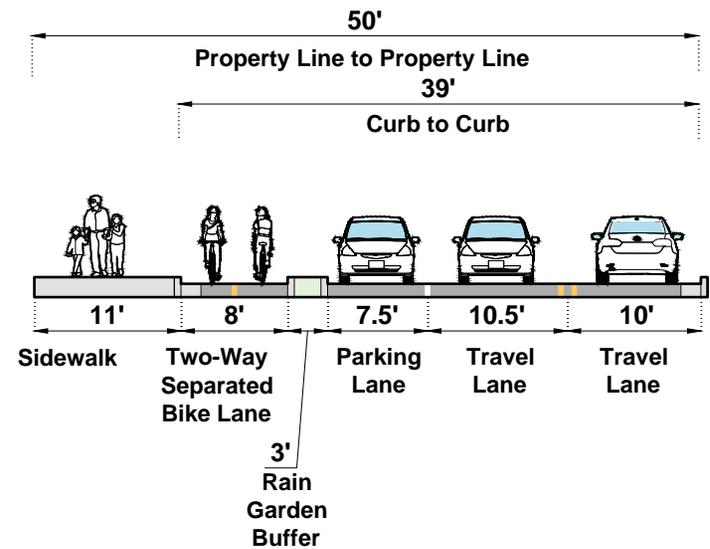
Tewksbury Ave (Castro St to Santa Fe Ave) - Proposed
